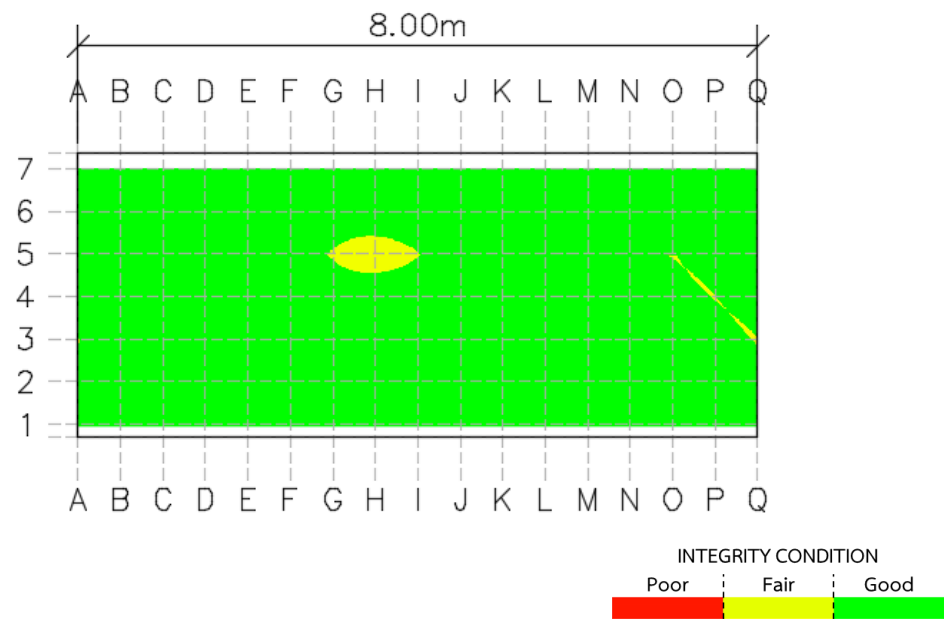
Integrity of concrete based on impact echo test on span no. 8
